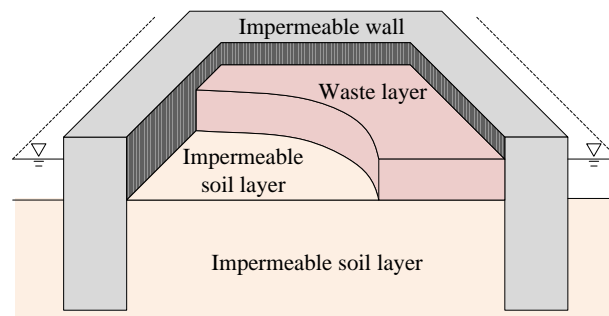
Impermeable walls constructed in coastal landfill sites.
